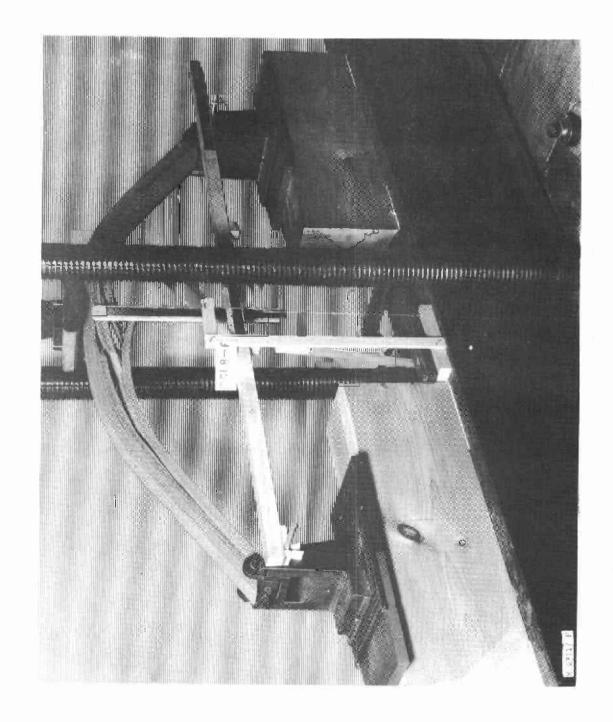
Laminated frame in testing machine showing a typical failure under transverse loading.
